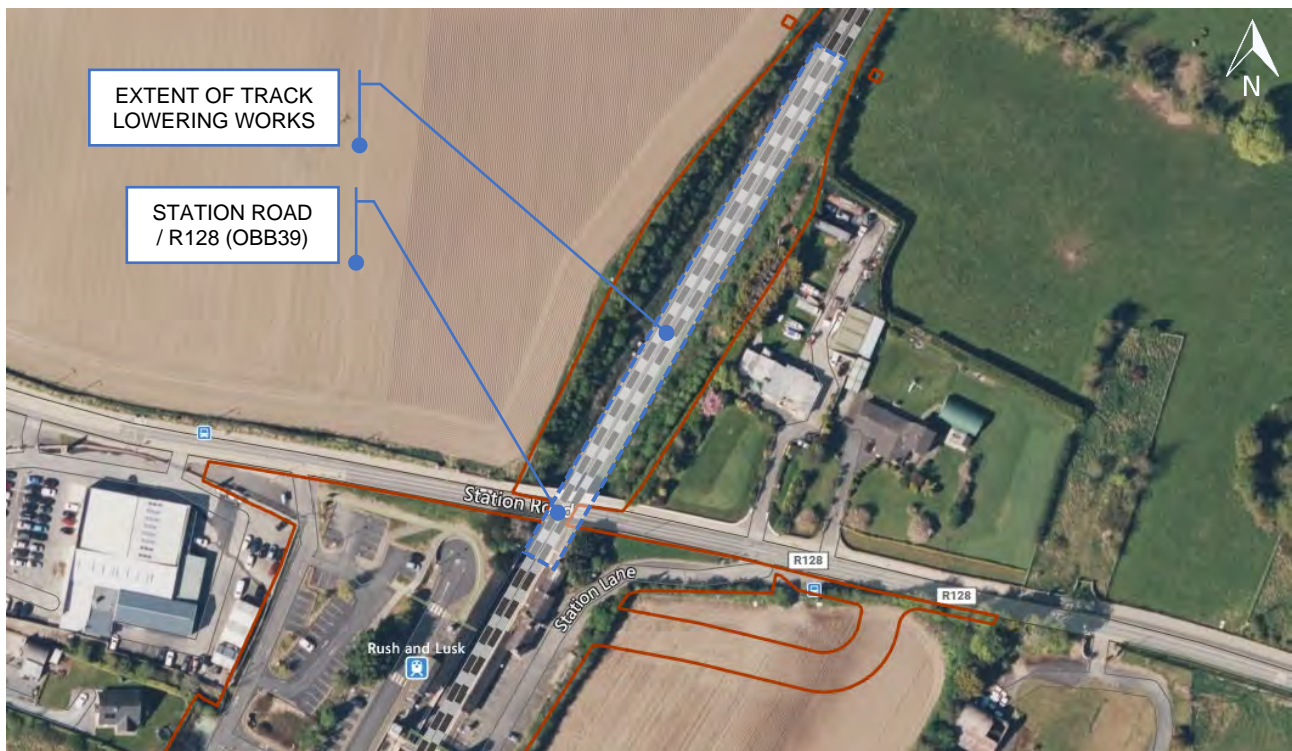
Extent of track lowering works at Station Road (OBB39) (Source: ESRI)
